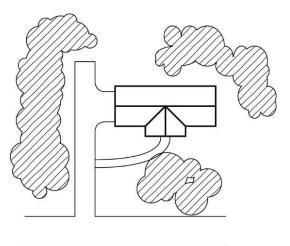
Tree save areas should include tree stands outside of the building envelope and outside driveway/parking areas.
